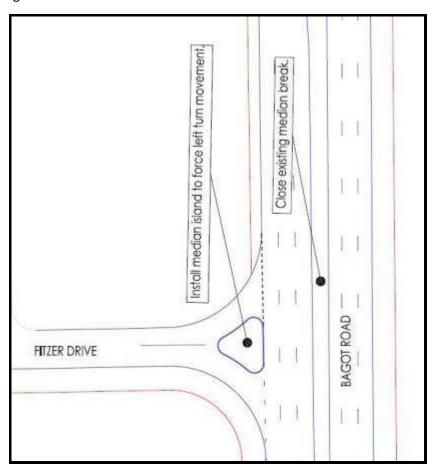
Fitzer Drive -Bagot Road left in left out Intersection (Source Citiland DA)
